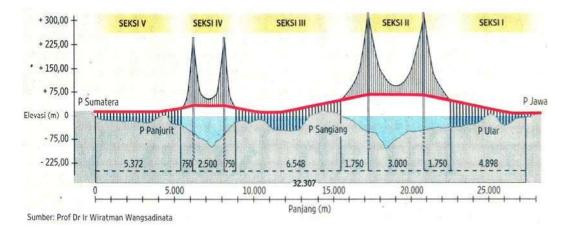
Proposal of new long span bridge at Sunda Straits [KOMPAS,2007]
